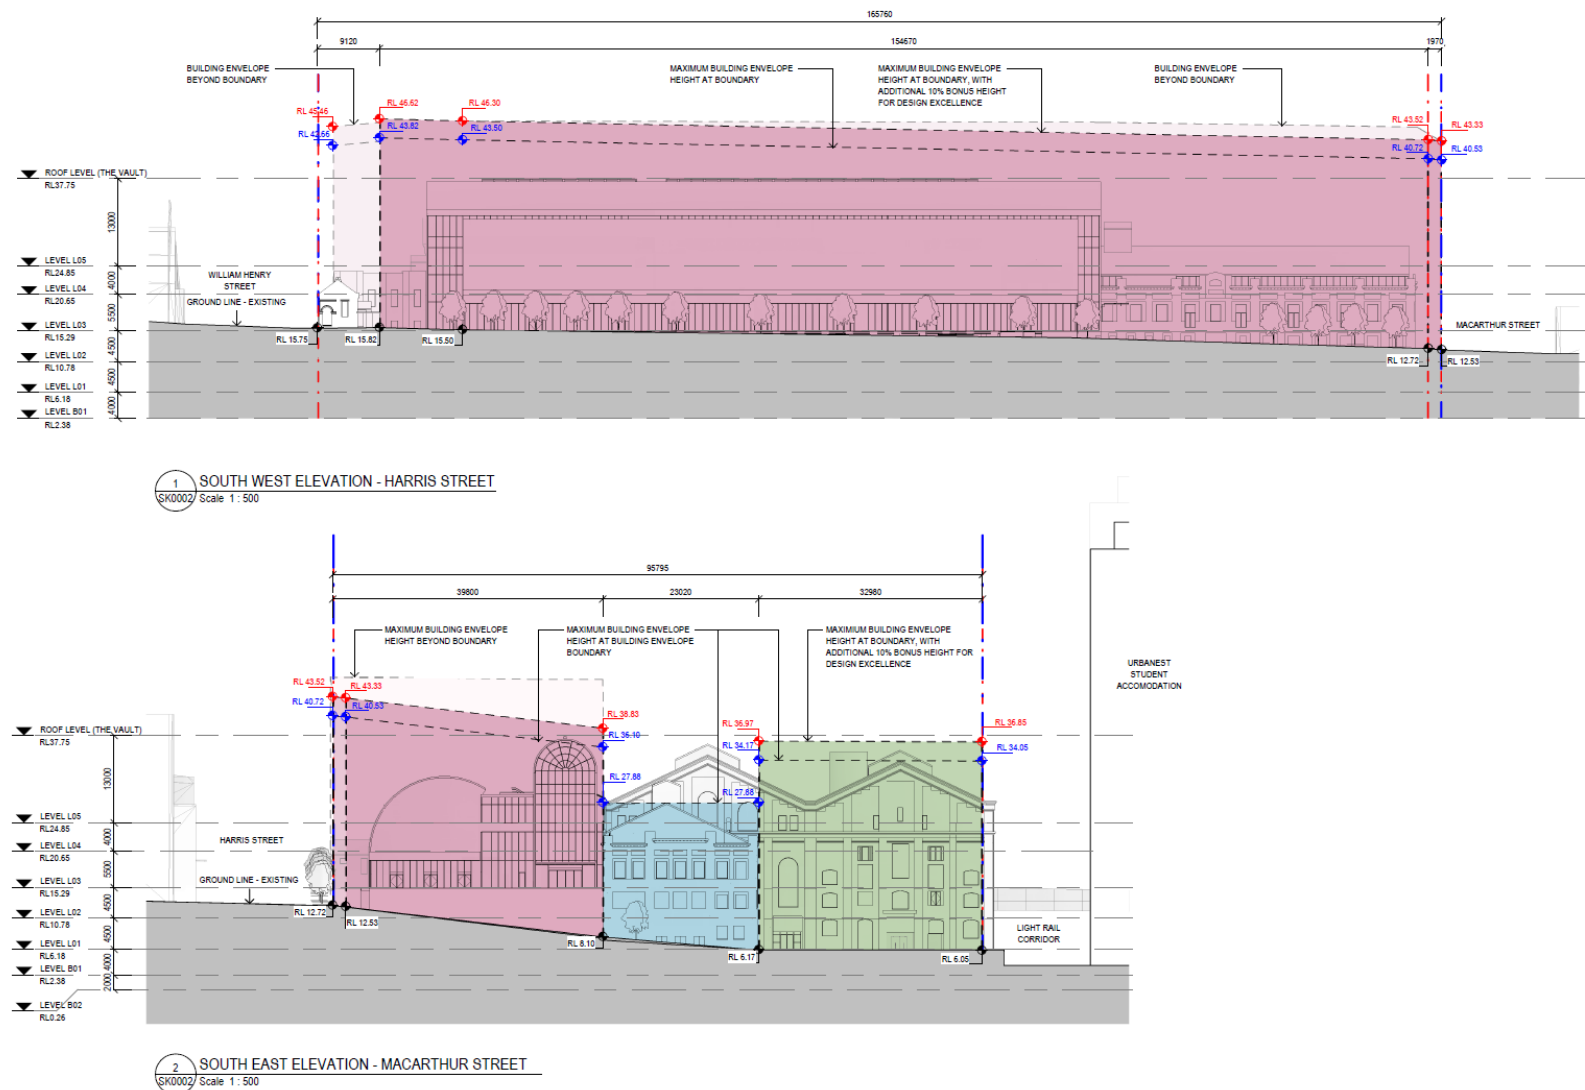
Ultimo Powerhouse- Building Envelope SE & SW Elevation (Source: John Wardle Architects, 22 Feb 2022)
